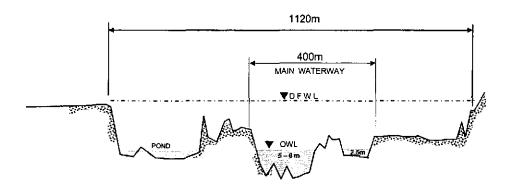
ANGAT RIVER SECTION AT PROPOSED SITE LOCATION
